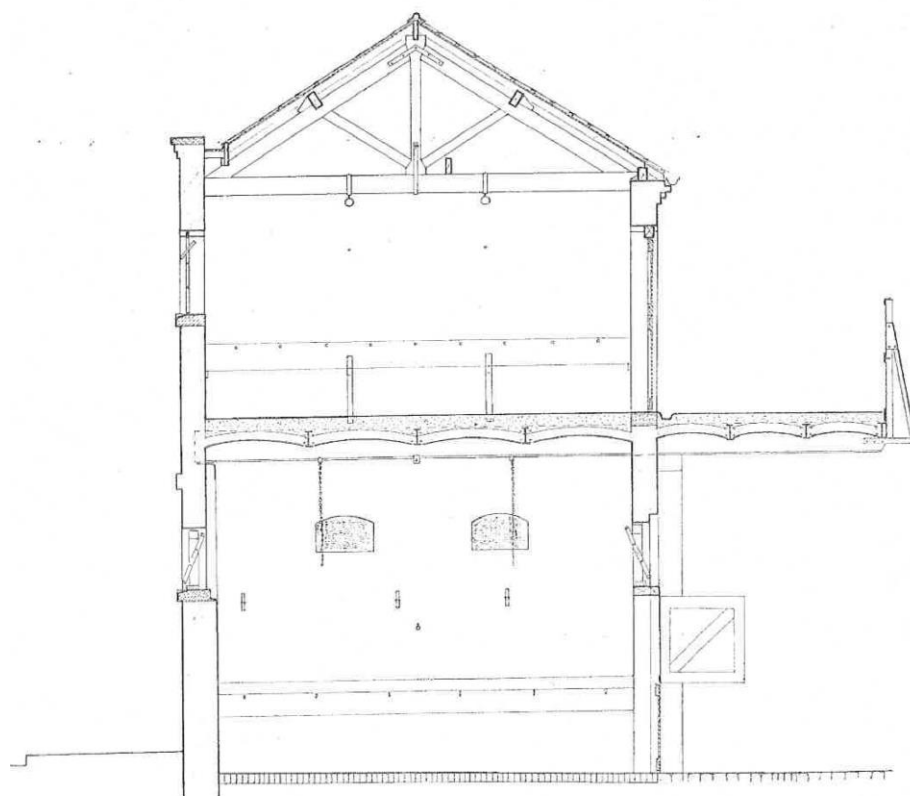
Long Stable South Elevation drawing. Note the horse ramp providing access to the first floor (now lost).
